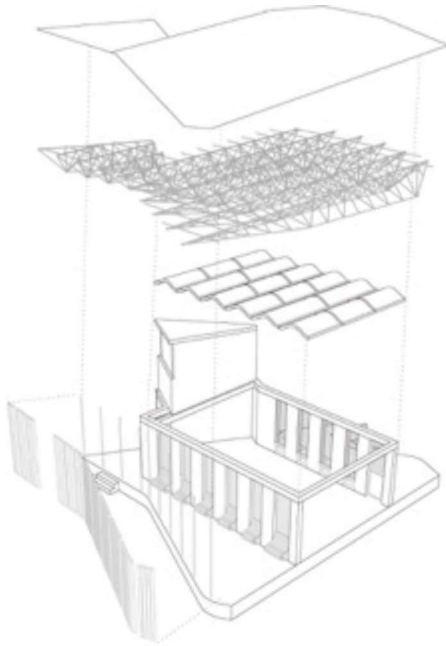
Exploded view of a typical classroom, showing the roof structure. © Kéré Architecture
